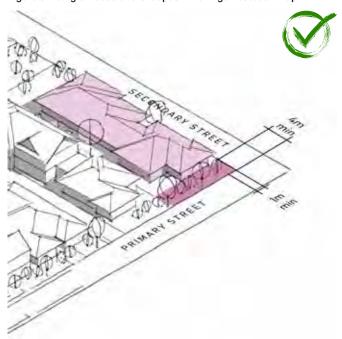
Single House and Grouped Dwellings - Street Setback Example Diagram
